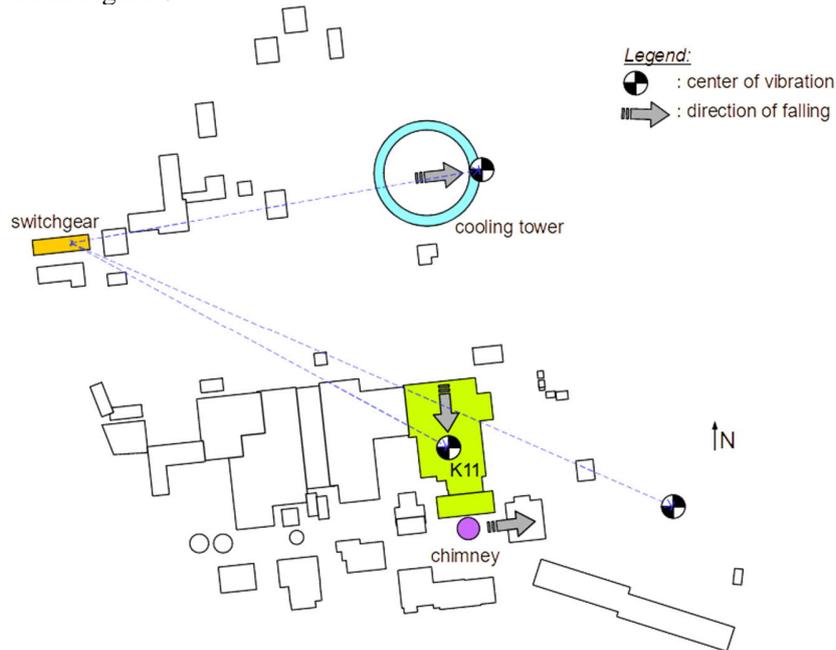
Site map: location of switchgear building, cooling tower, block K11 and chimney as well as sketches of surrounding buildings
